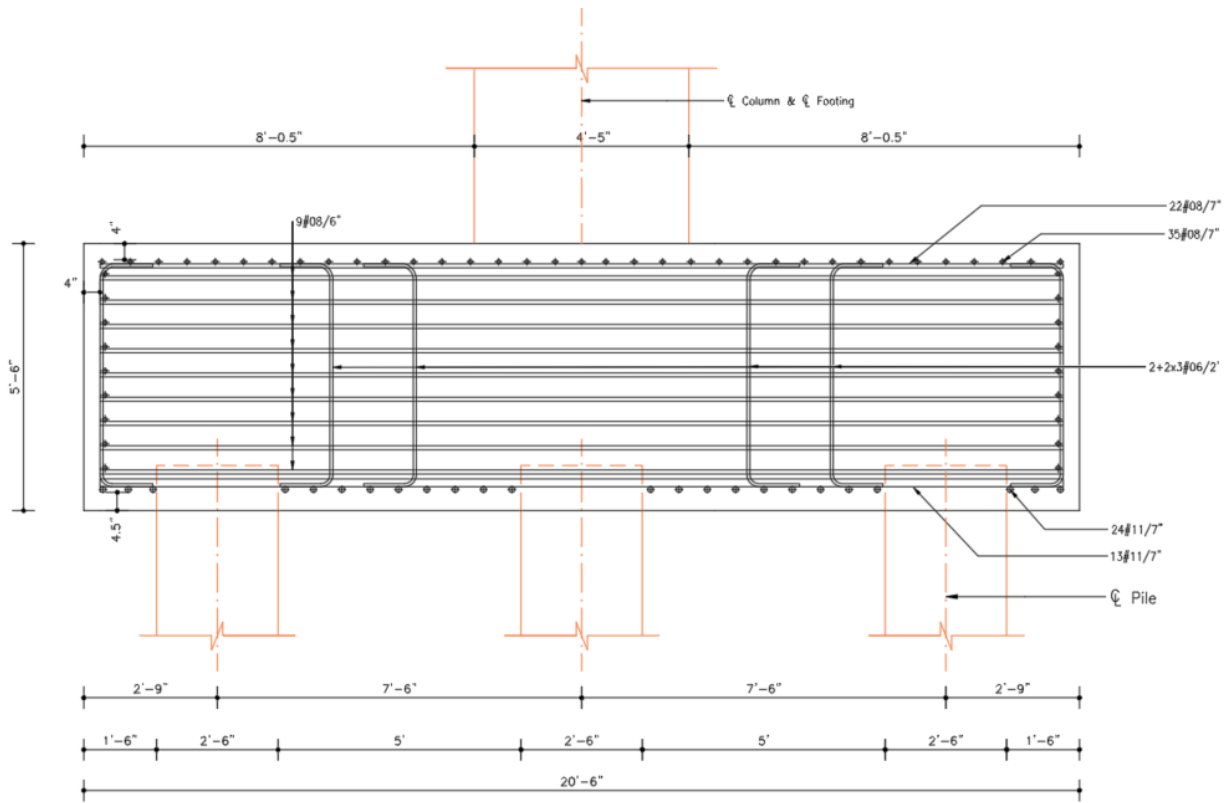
GFRP reinforcement layout (longitudinal view) – Pile cap 6-pile group “B” of the selected Pier n.24 of the Eastbound Bridge
